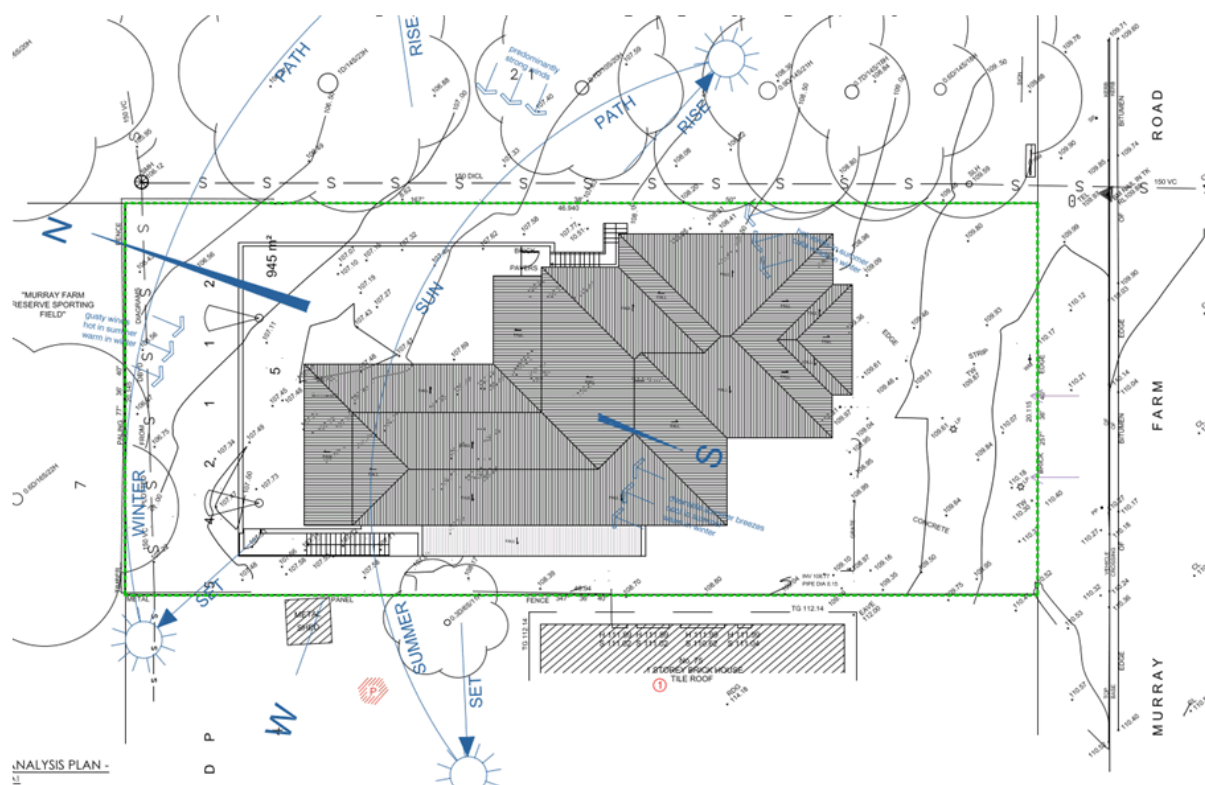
Site Plan. Source: Submitted Architectural plans prepared by Janssen Designs.
